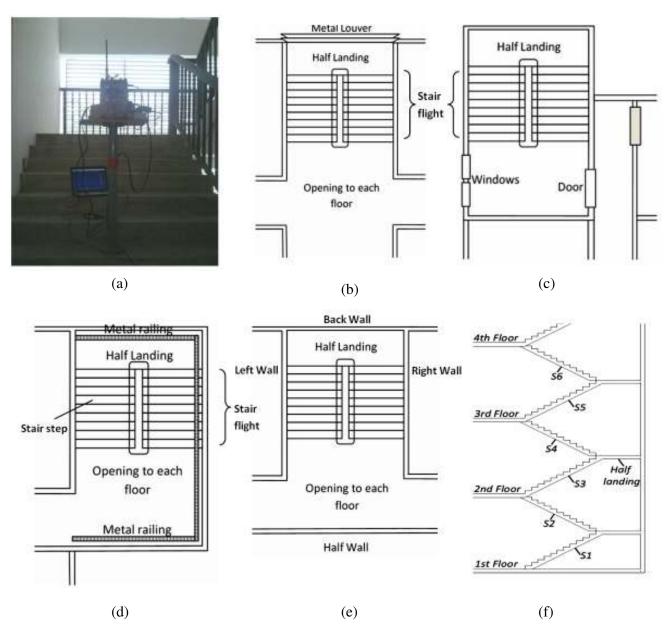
(a) Receiver-end setup at Site 1, (b) layout of Site 1, (c) layout of Site 2, (d) Layout of Site 3, (e) layout of Site 4 and (f) cross-sectional view of dog-leg stairwell investigated.
